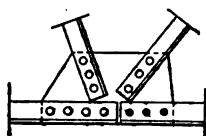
Detail of Joint E, Fink Truss, Fig. 7
